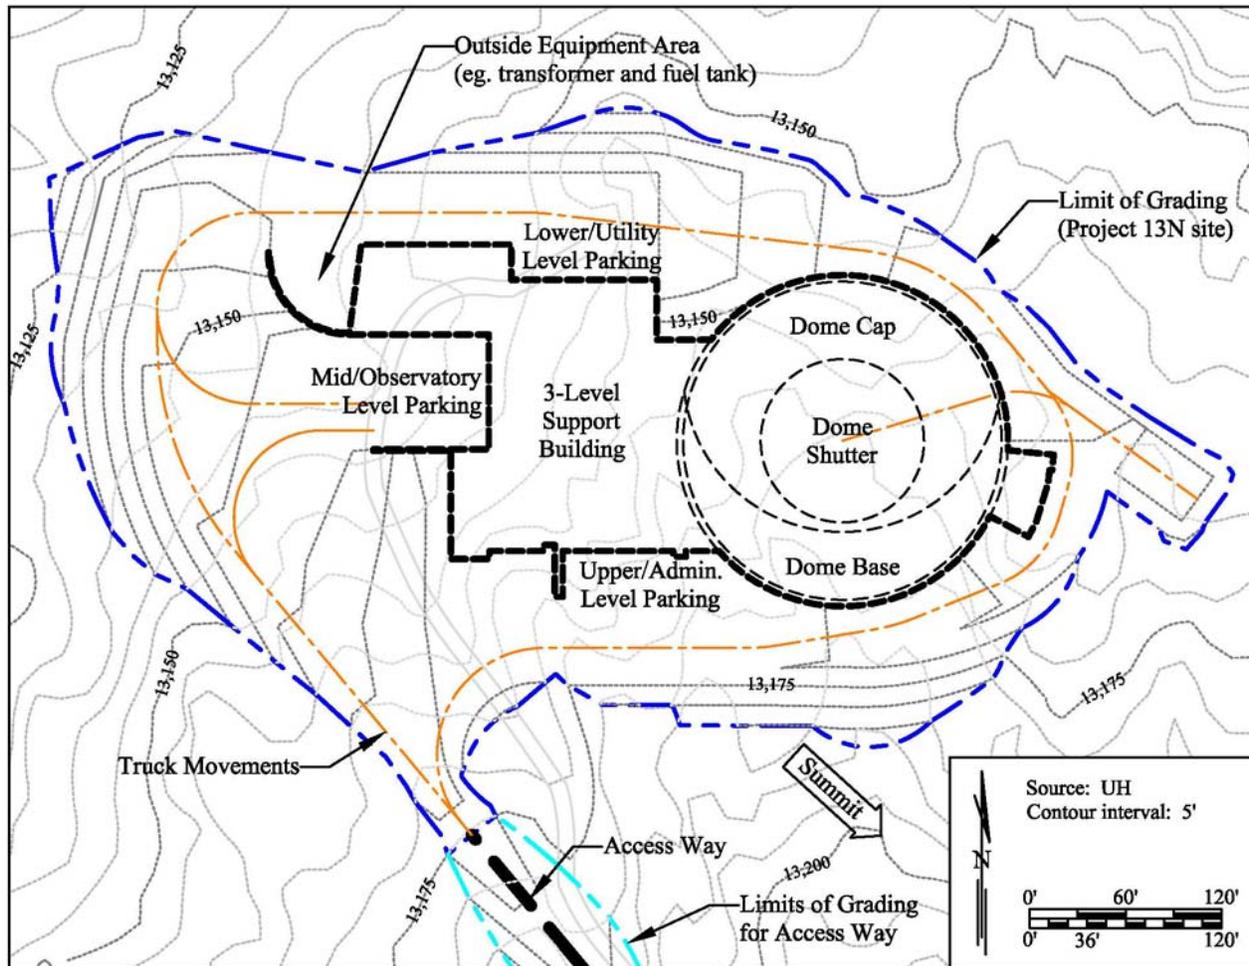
Proposed TMT Observatory Plan View and Grading Plan
